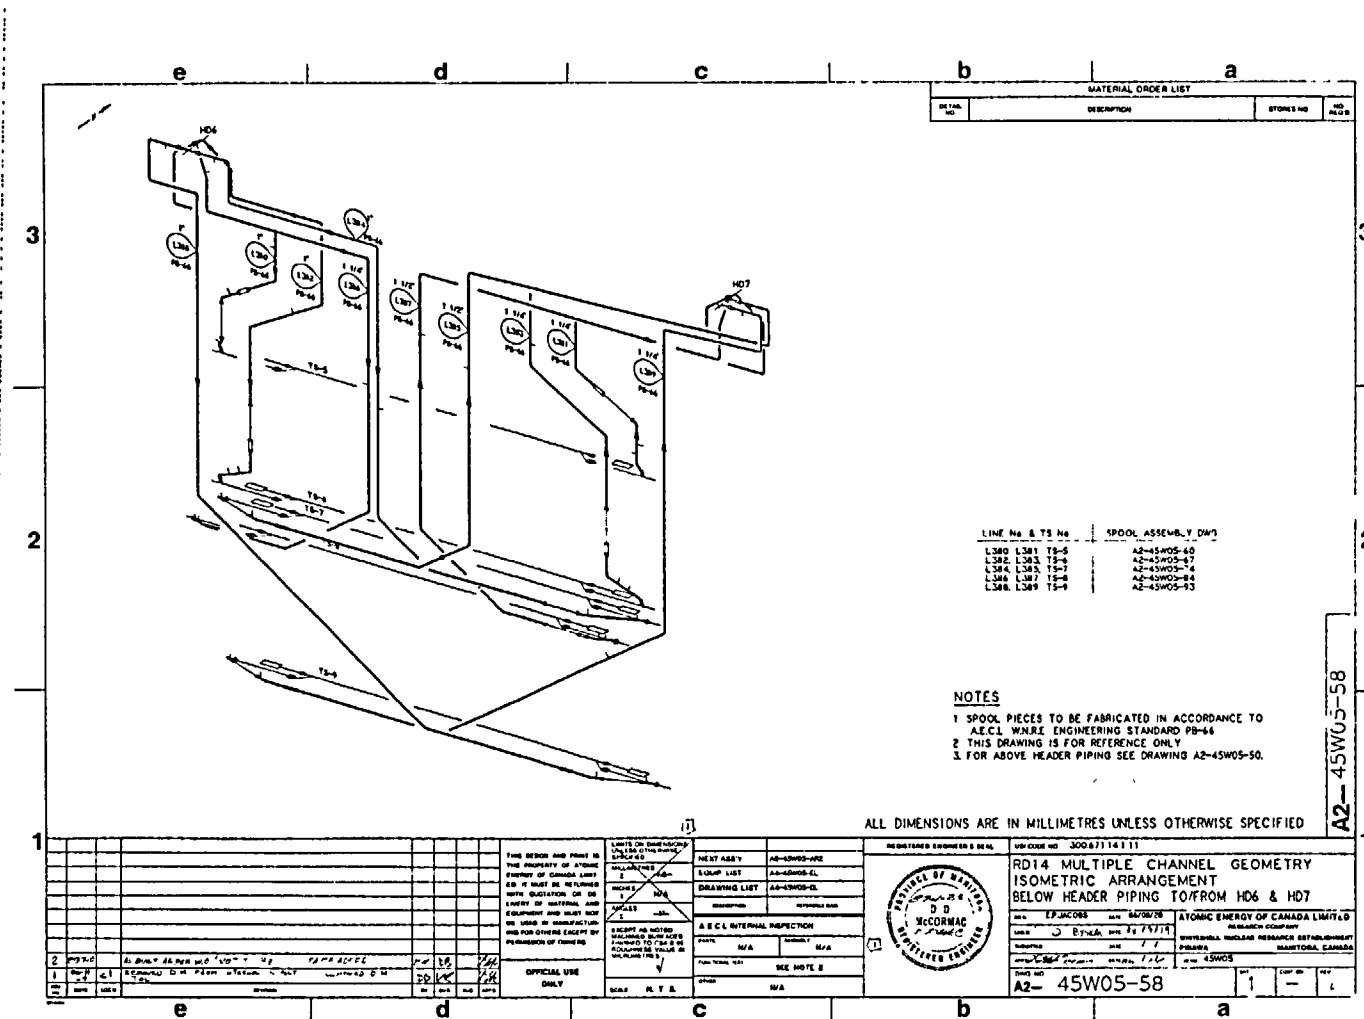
RD-14M Channel Geometry Isometric Arrangement: Below Header Piping to/from HDR6 and HDR7 (Drawing A2-45W05-58)
